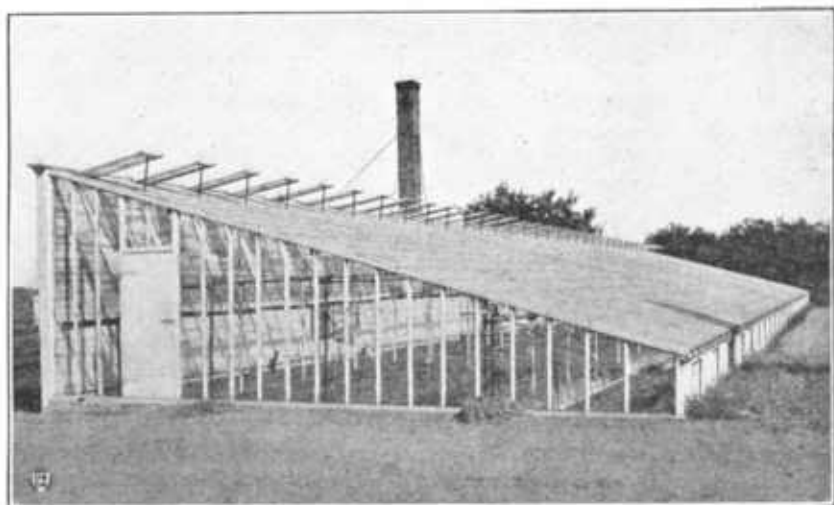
Lean-to house with two or more walks, which may be of any desired width. Instead of building the house shown here against some existing wall, it was constructed with one wooden wall.
